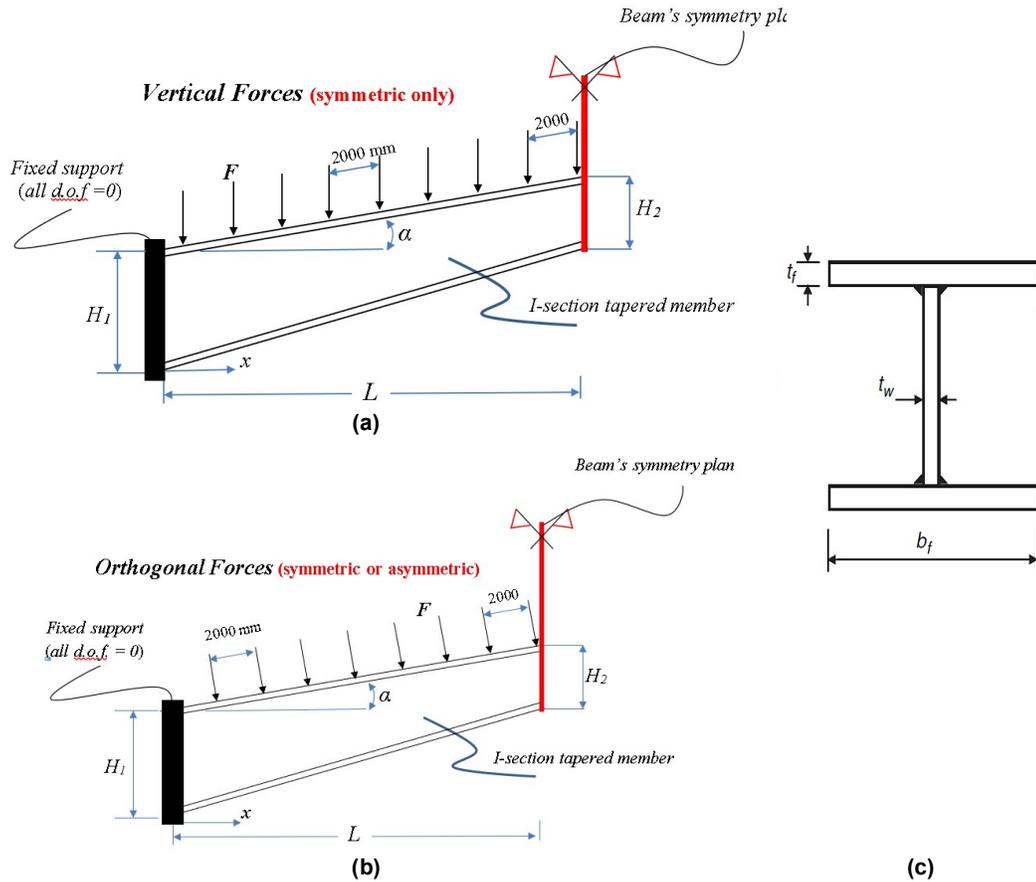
I-Section beam-columns adopted: (a) vertical and (b) orthogonal loading (c) cross-section
